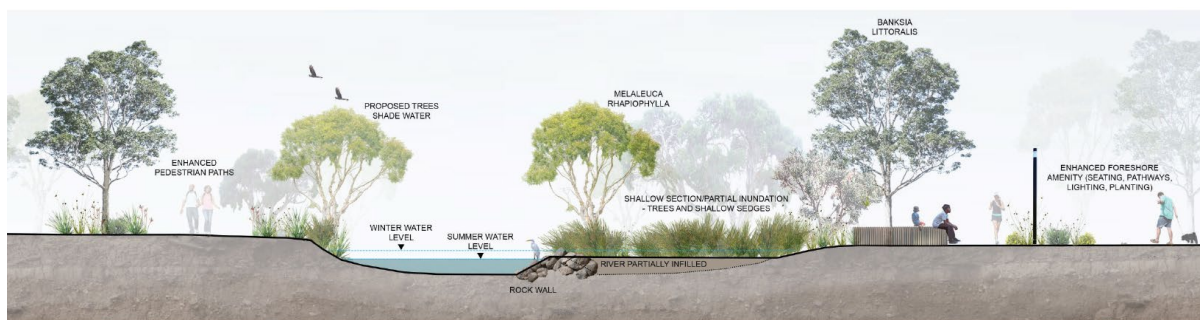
Cross-section of the bench structure showing infill area, dense planting and average summer and winter water levels.
